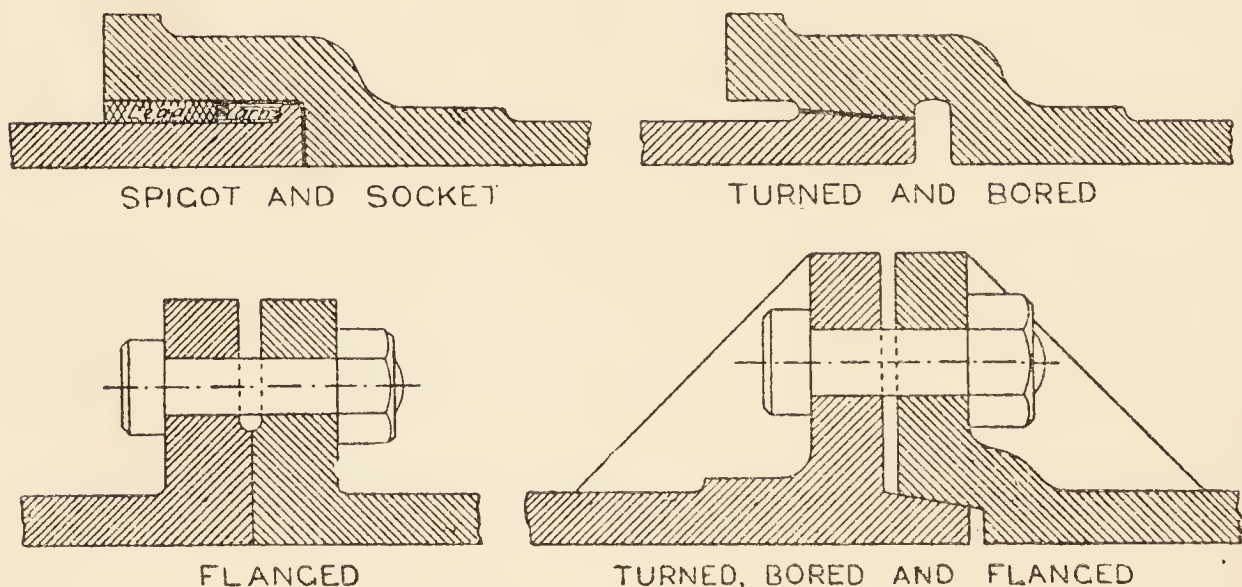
Spigot and socket joint in cast-iron pipes.
